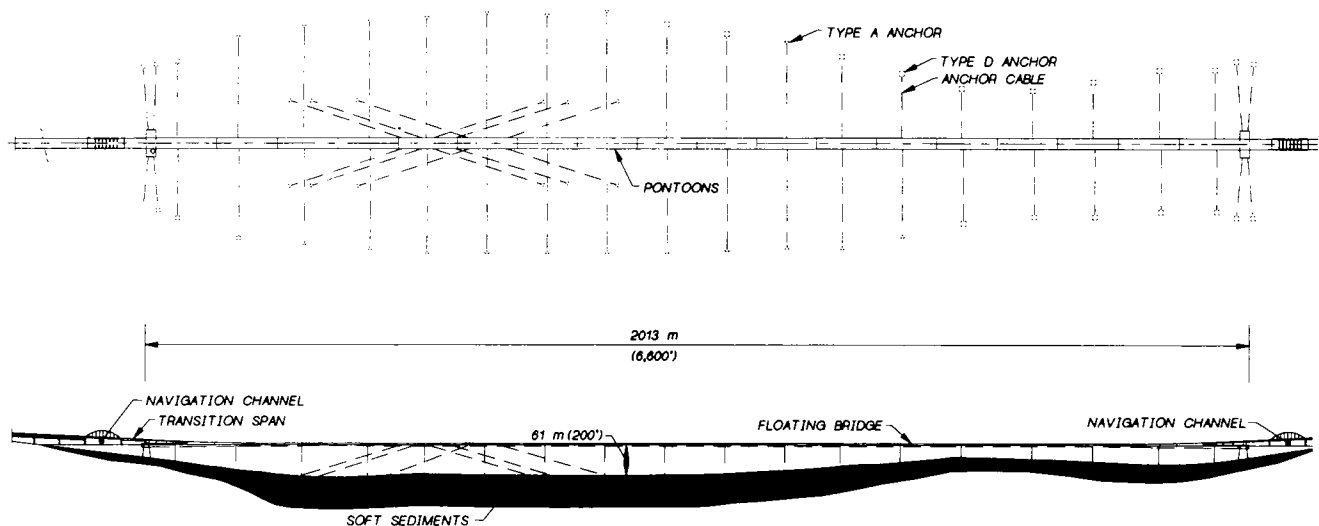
Lacey V. Murrow Floating Bridge: *top*, plan; *bottom*, elevation.
